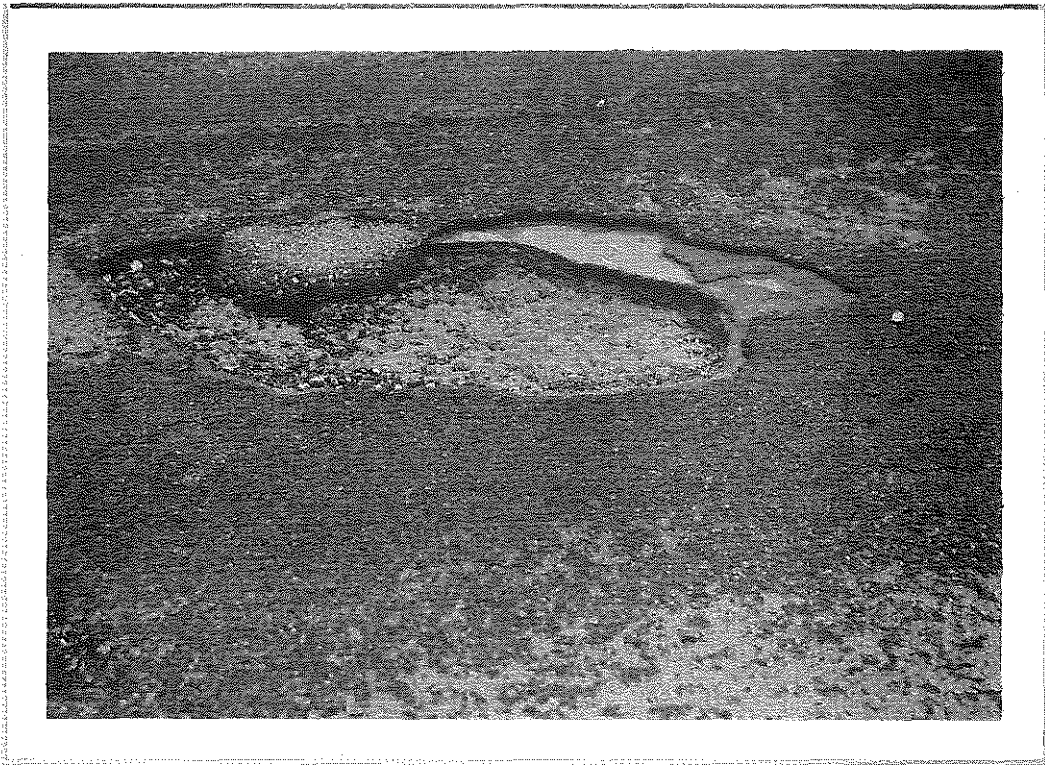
Deterioration of the Underlying Concrete Exposing the Reinforcing Steel.
